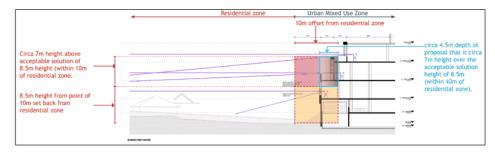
Extent of the building outside 8.5m within 10m of the boundary to Seymour Street properties (source: SPA adapted by Ireneinc)
